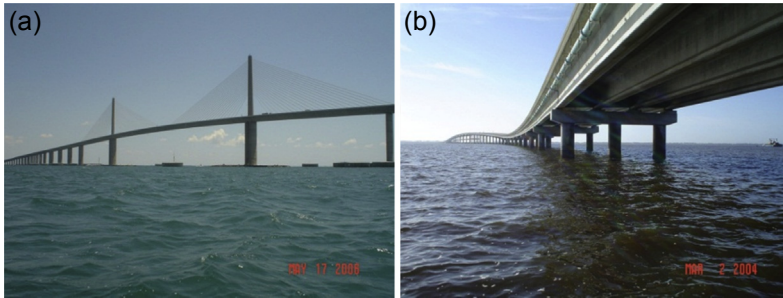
Examples of prestressed concrete elements. (a) Sunshine Skyway Bridge, FL (segmental box girders and columns). (b) St. George Island Bridge, FL (concrete cylinder piles and girders).
